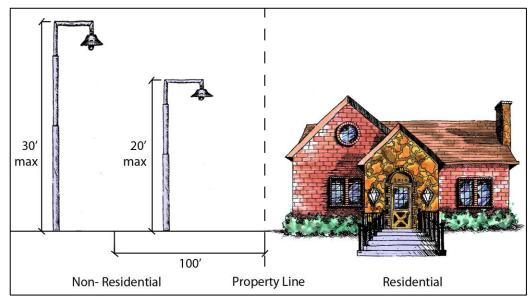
Open Area Used for Motor Vehicle Parking, Storage or Access
